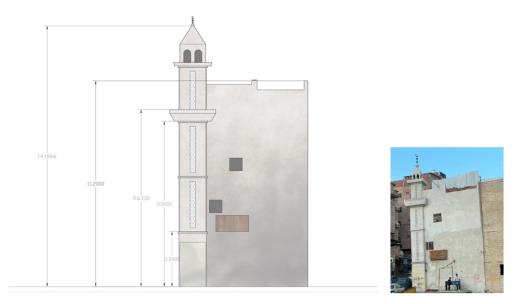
Shows a new architectural style for mosques in Al-Khalidiyah. (Source: Author).
